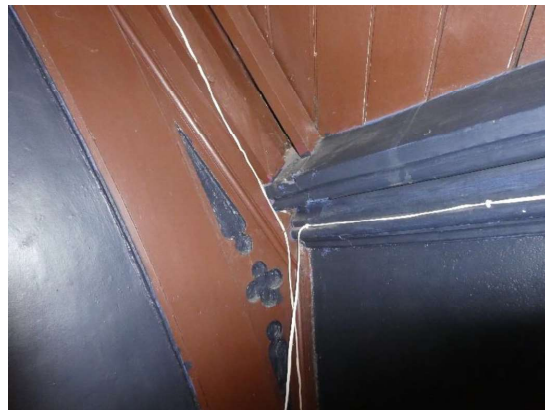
Showing the timber rafters built into the solid brick external walls to the western wall of the north western stairwell.
